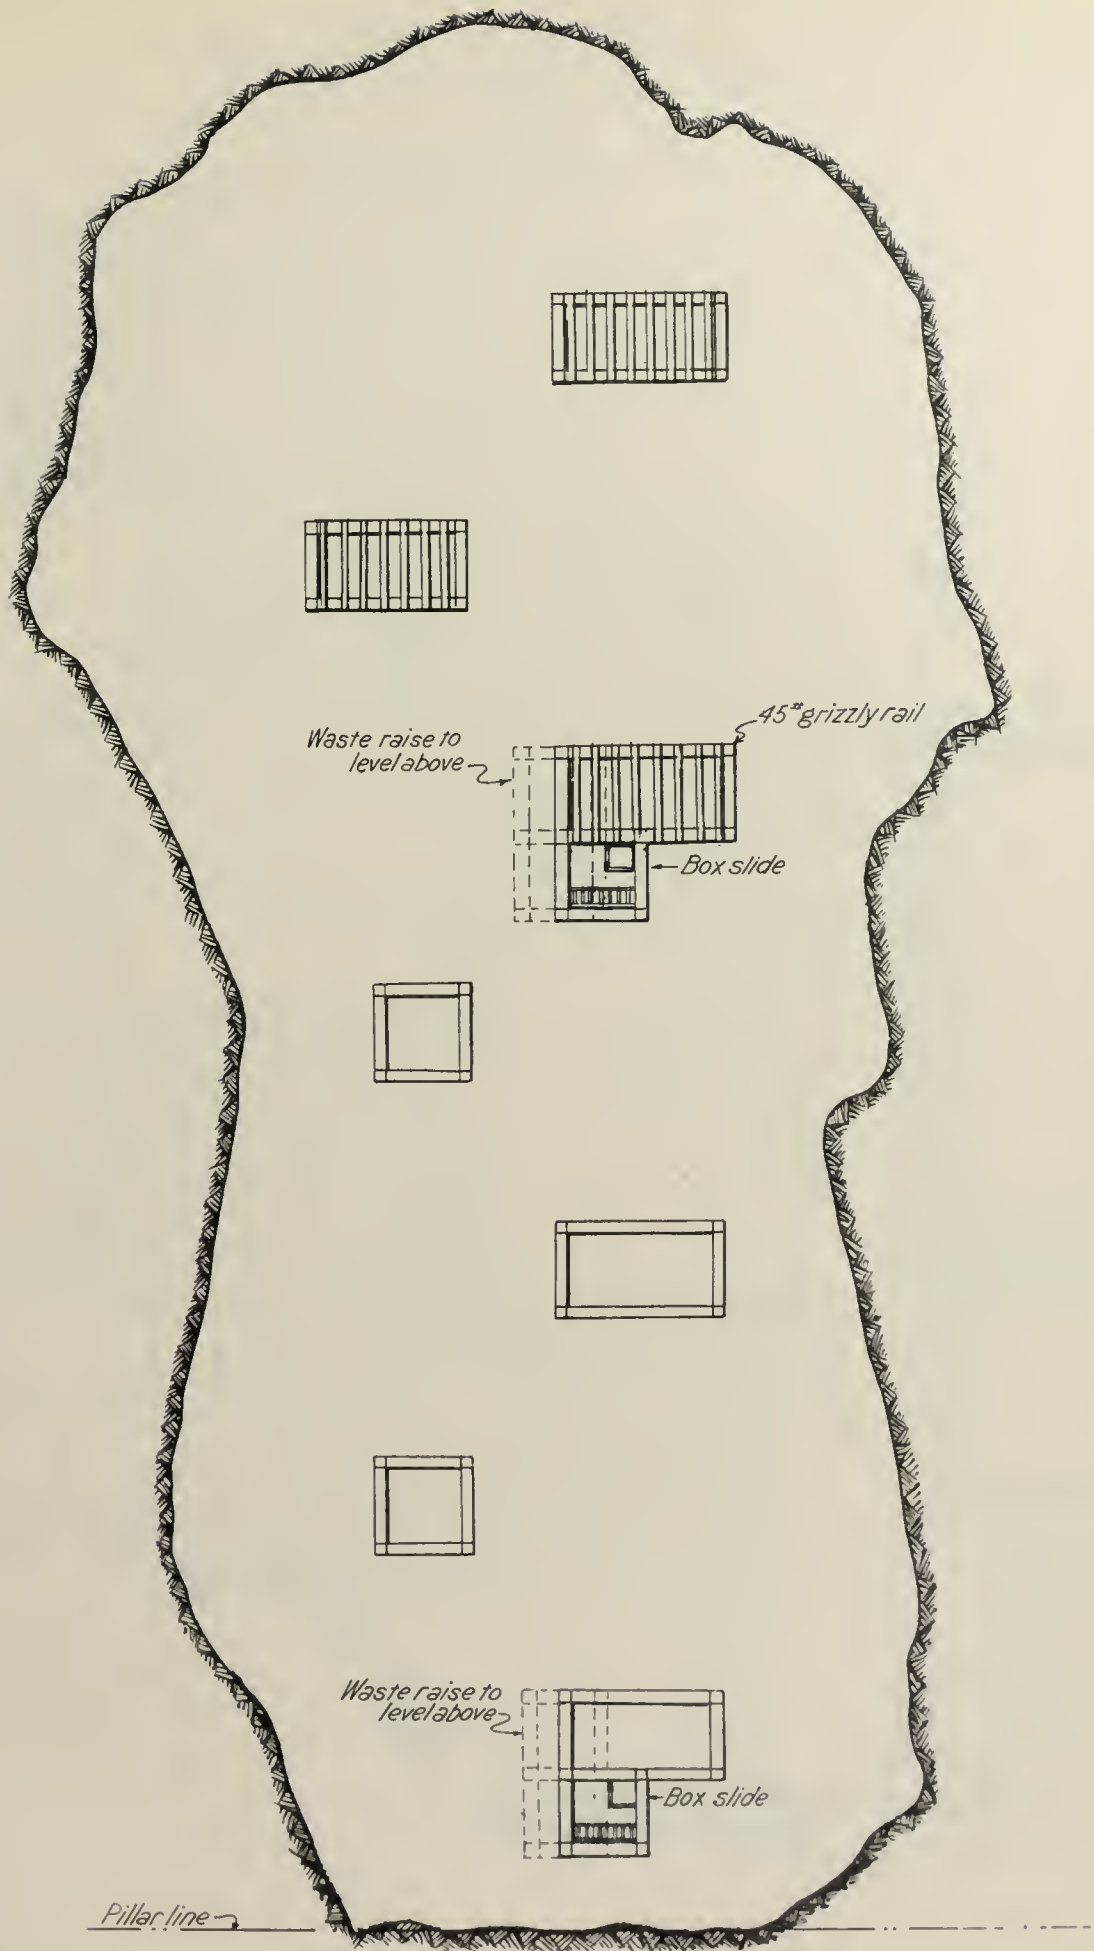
Plan of typical cut-and-fill stope, showing chutes
